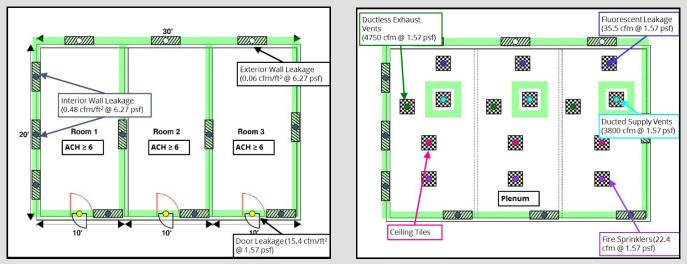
Occupied Space for the Adjacent Rooms with Ducted Supply and Ductless Return (left) and Their Ceiling Plenum (right)
